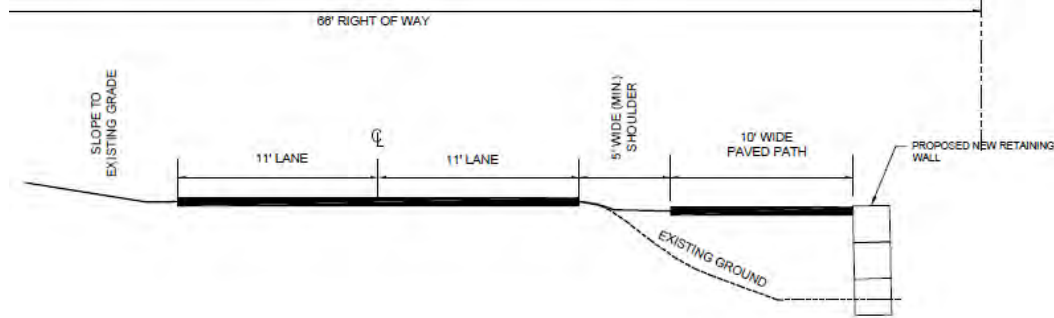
Typical Cross Section of the Path with a Retaining Wall
